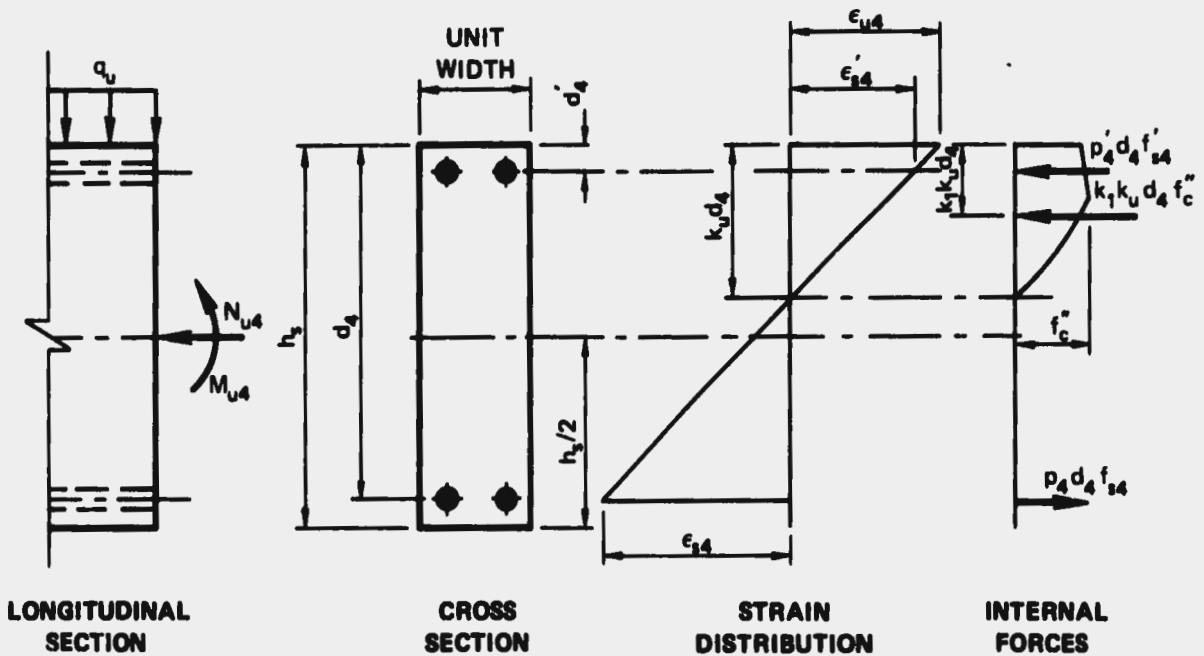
CONDITIONS AT SECTION 4 OF STRIP 4-2
